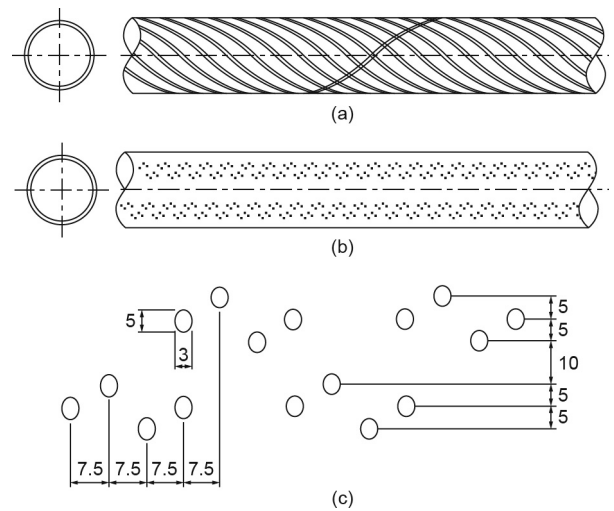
Surface-modification cables. (a) Spiral protuberance cable; (b) indented cable; (c) dimensions of indentation (unit: mm).
